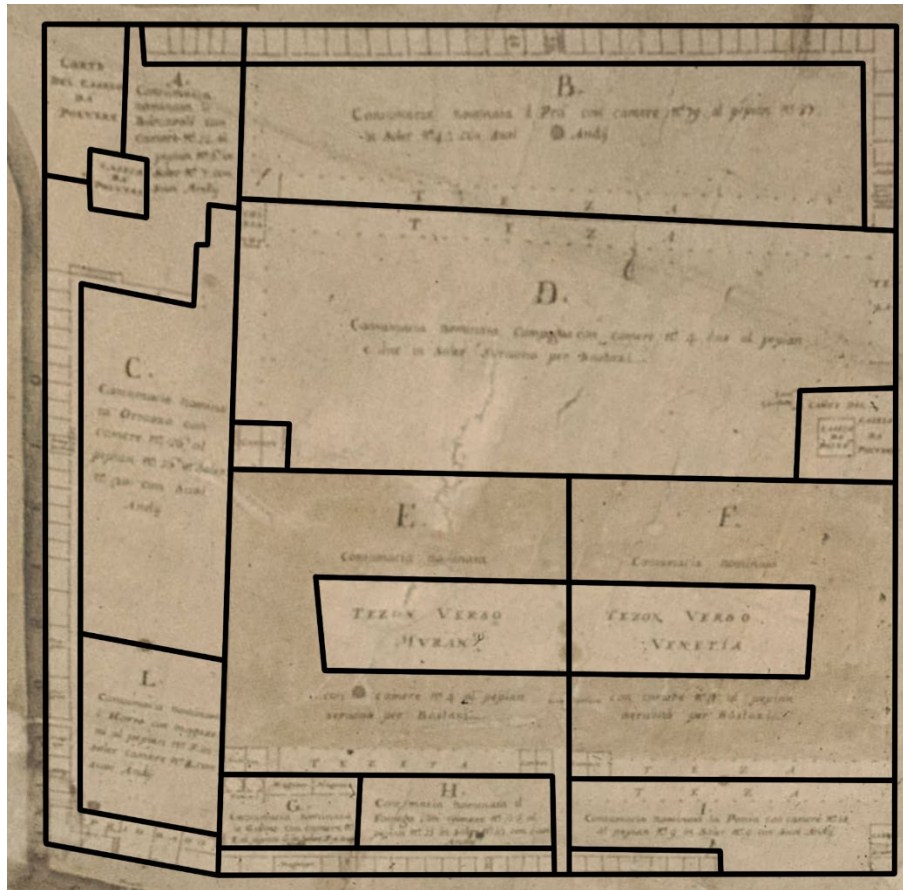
Plan of the Lazzaretto Nuovo. Redrawn by the author from Andrea Cornello, 1687.
